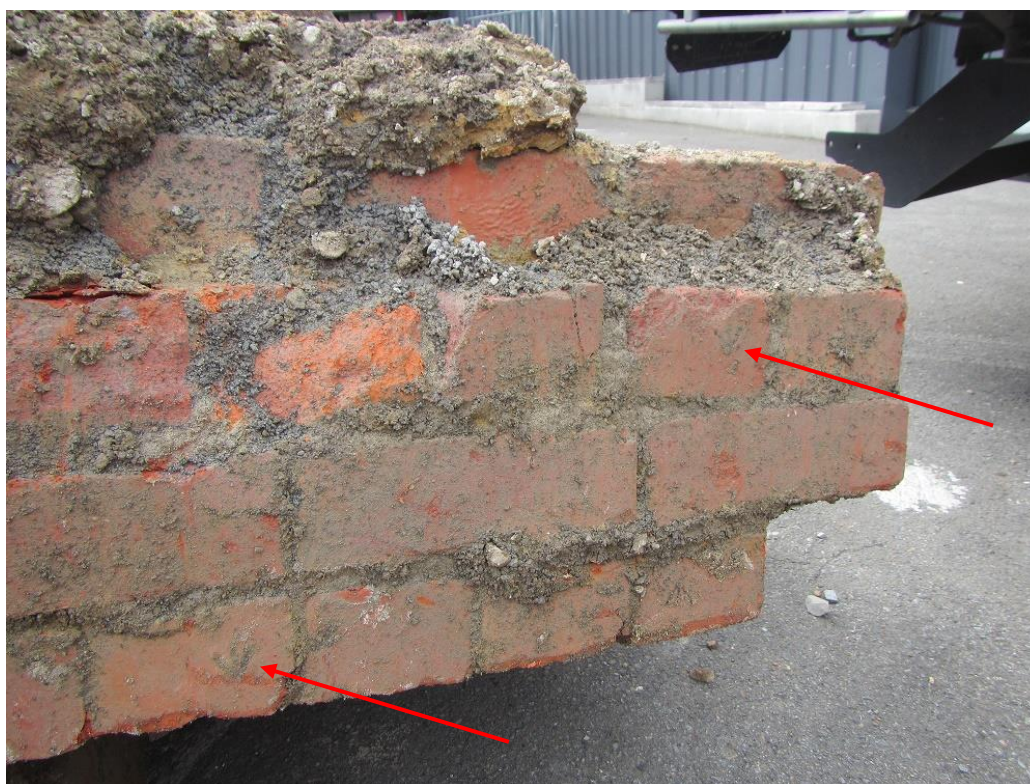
Portion of brick wall with the prison 'arrows' indicated
